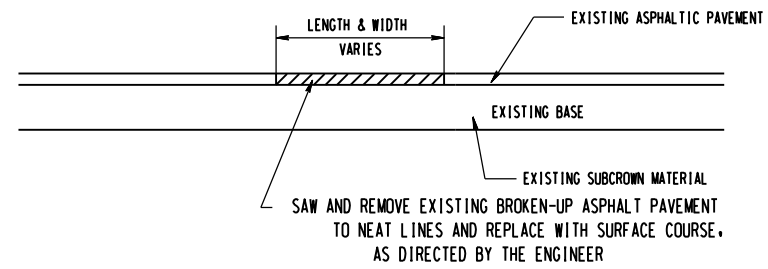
DETAILS OF REPAIRING EXISTING PAVEMENT PRIOR TO RESURFACING FOR FULL DEPTH AND MILLING
